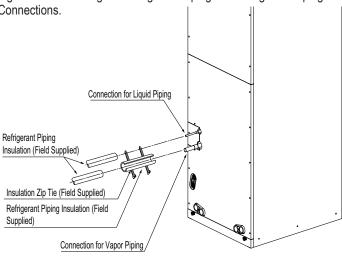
Insulating the Refrigerant Piping and Refrigerant Piping Connections.
